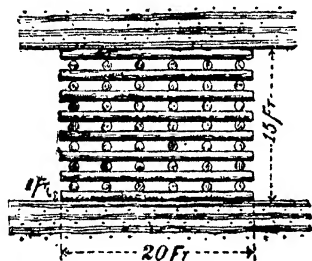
Timber structure for supporting the roof, Wieliczka, Austria.
